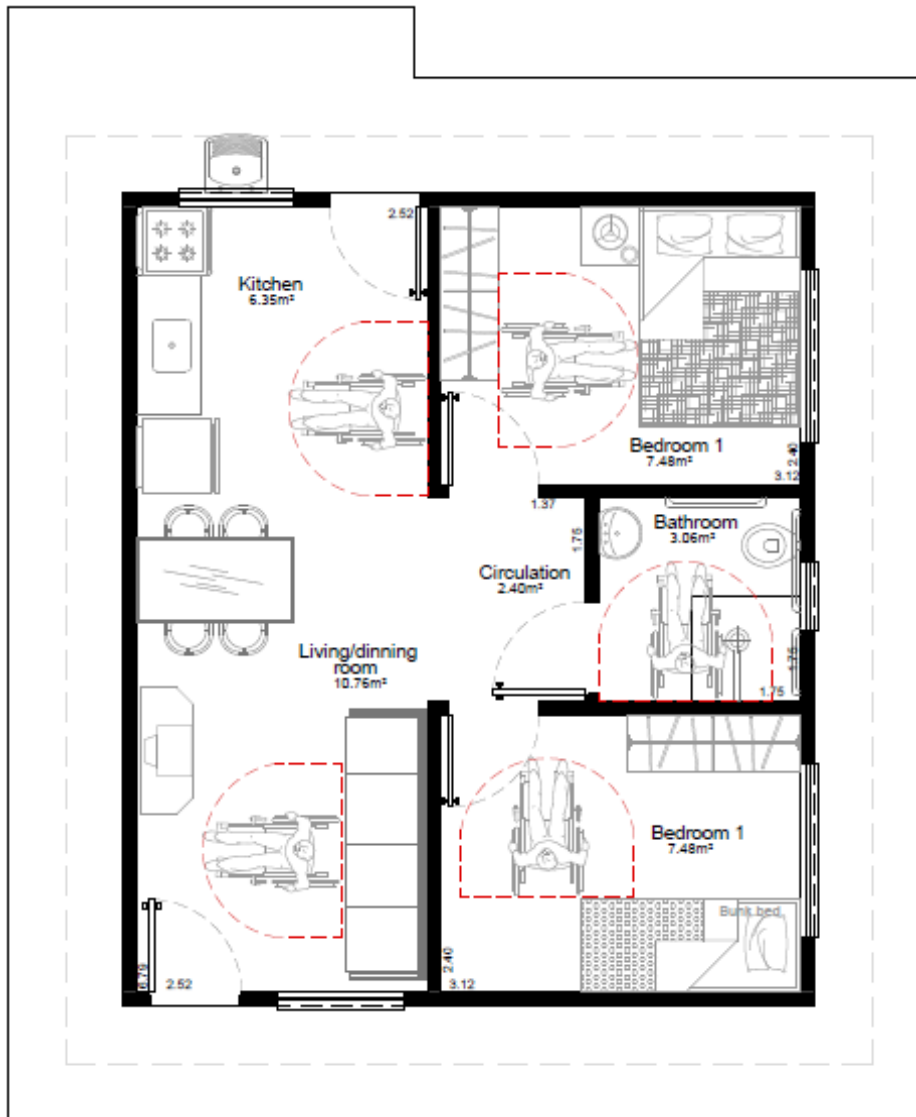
Floor plan of a detached house of Ary Abussafi De Lima and Gregorio Correa.
